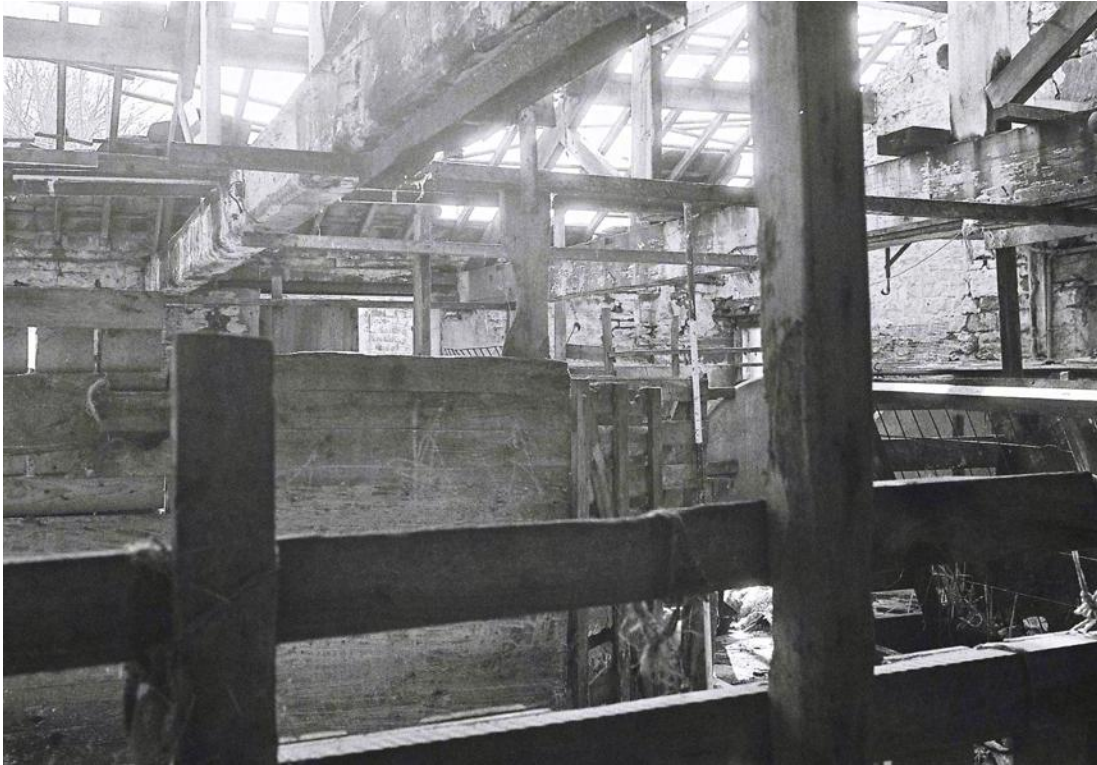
Shaw House Farm: Later Barn Interior Ground Floor. Facing South.
